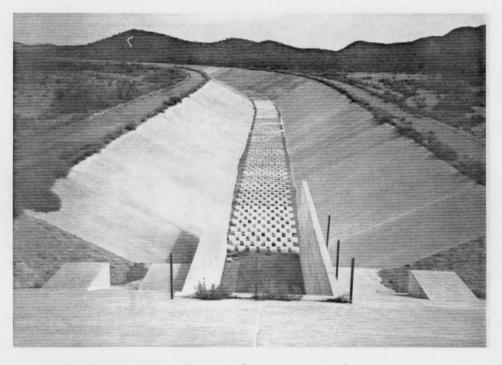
Flood Control Outlet Works Outlet Channel (view from spillway embankment, looking downstream).
